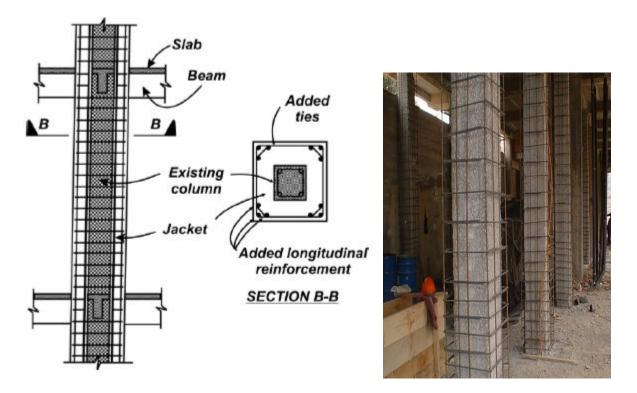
Construction techniques for column jacketing (*Safeguard your structure by Column Jacketing*, no date)
